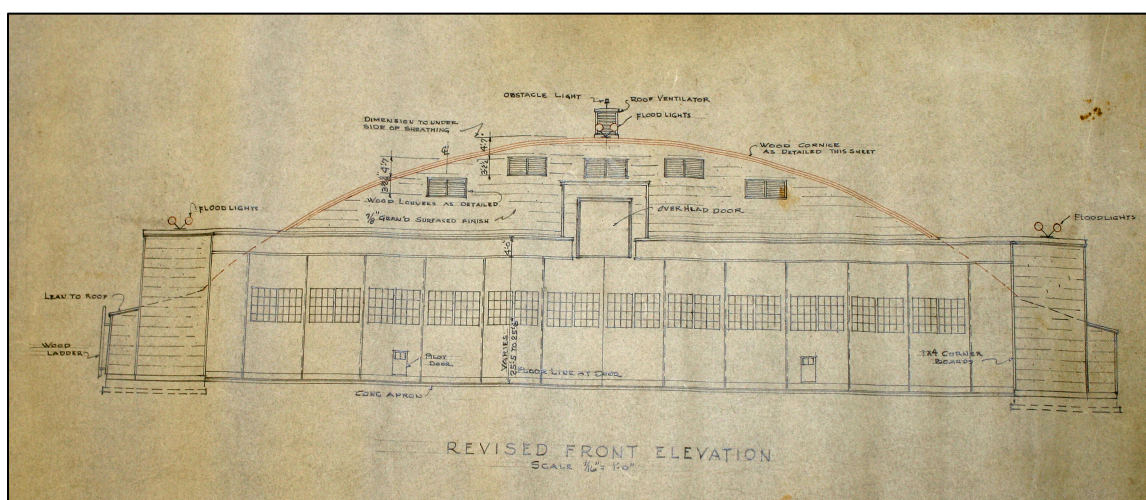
Undated elevation for a "Revised Front Elevation." (Great Bend city records.)
